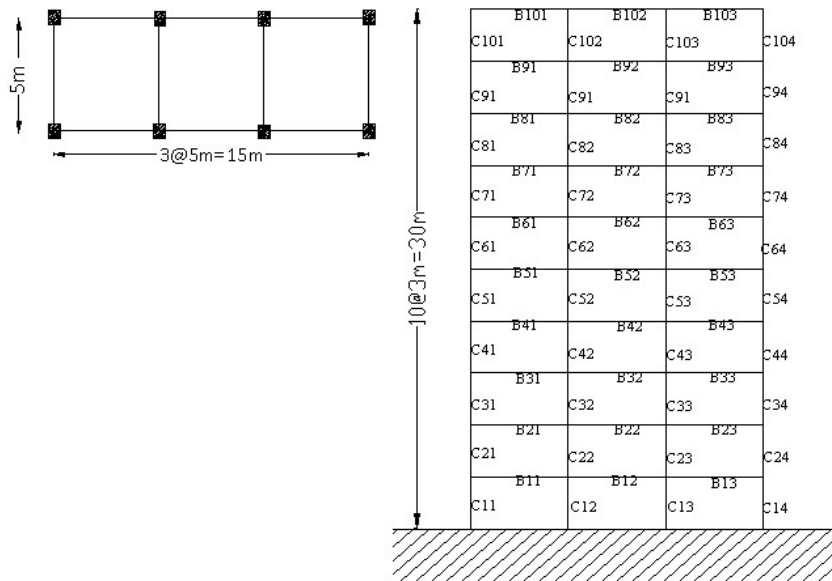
Plan and elevation of B10Z5 and B10Z3
